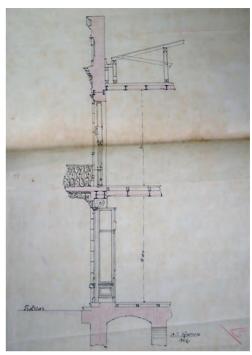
Aligning project. Detail of vertical section through façade. 6, Lipscani Street (AN-DMB, PMB Collection, Technical Service, file 41/1890,
